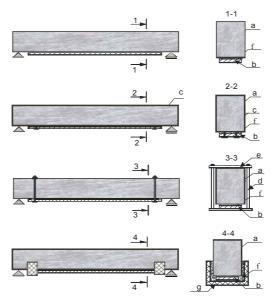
Strengthening of RC beams with FRP soffit plates. a- concrete; b-FRP plate; c- anchor bolts; d, e - elements of the metallic jig; f - adhesive layer
